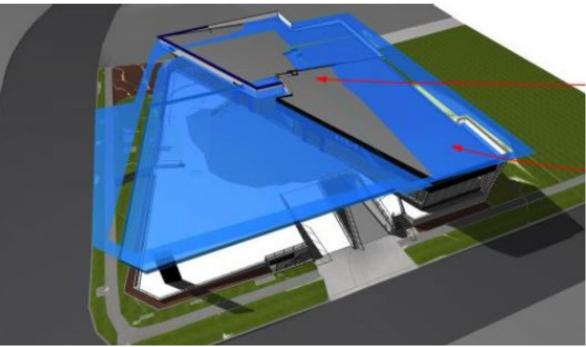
Building height plane looking from Linton Avenue in a north-western direction. The blue indicates the 9.5m building height plane. The elements above this plane are shown in brown.
